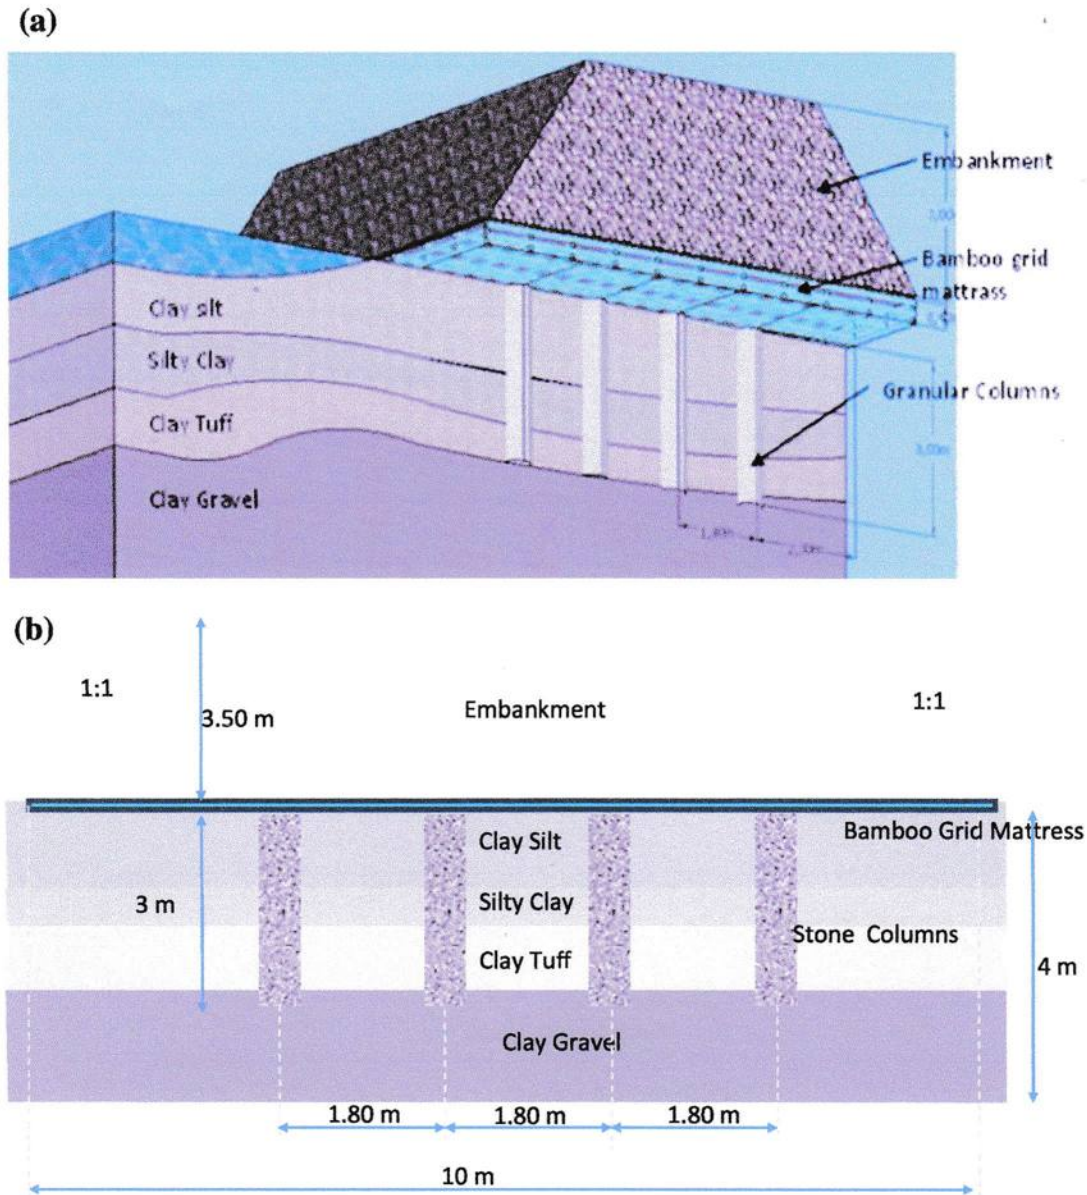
Schematic (a) and cross sectional (b) views of reinforced embankment with bamboo mattress and stone columns.
